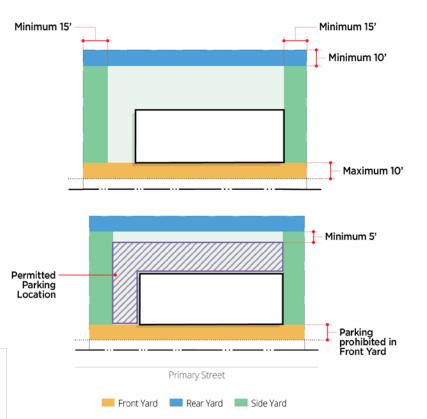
Outlot/Liner Commercial Building Type Parking Location
